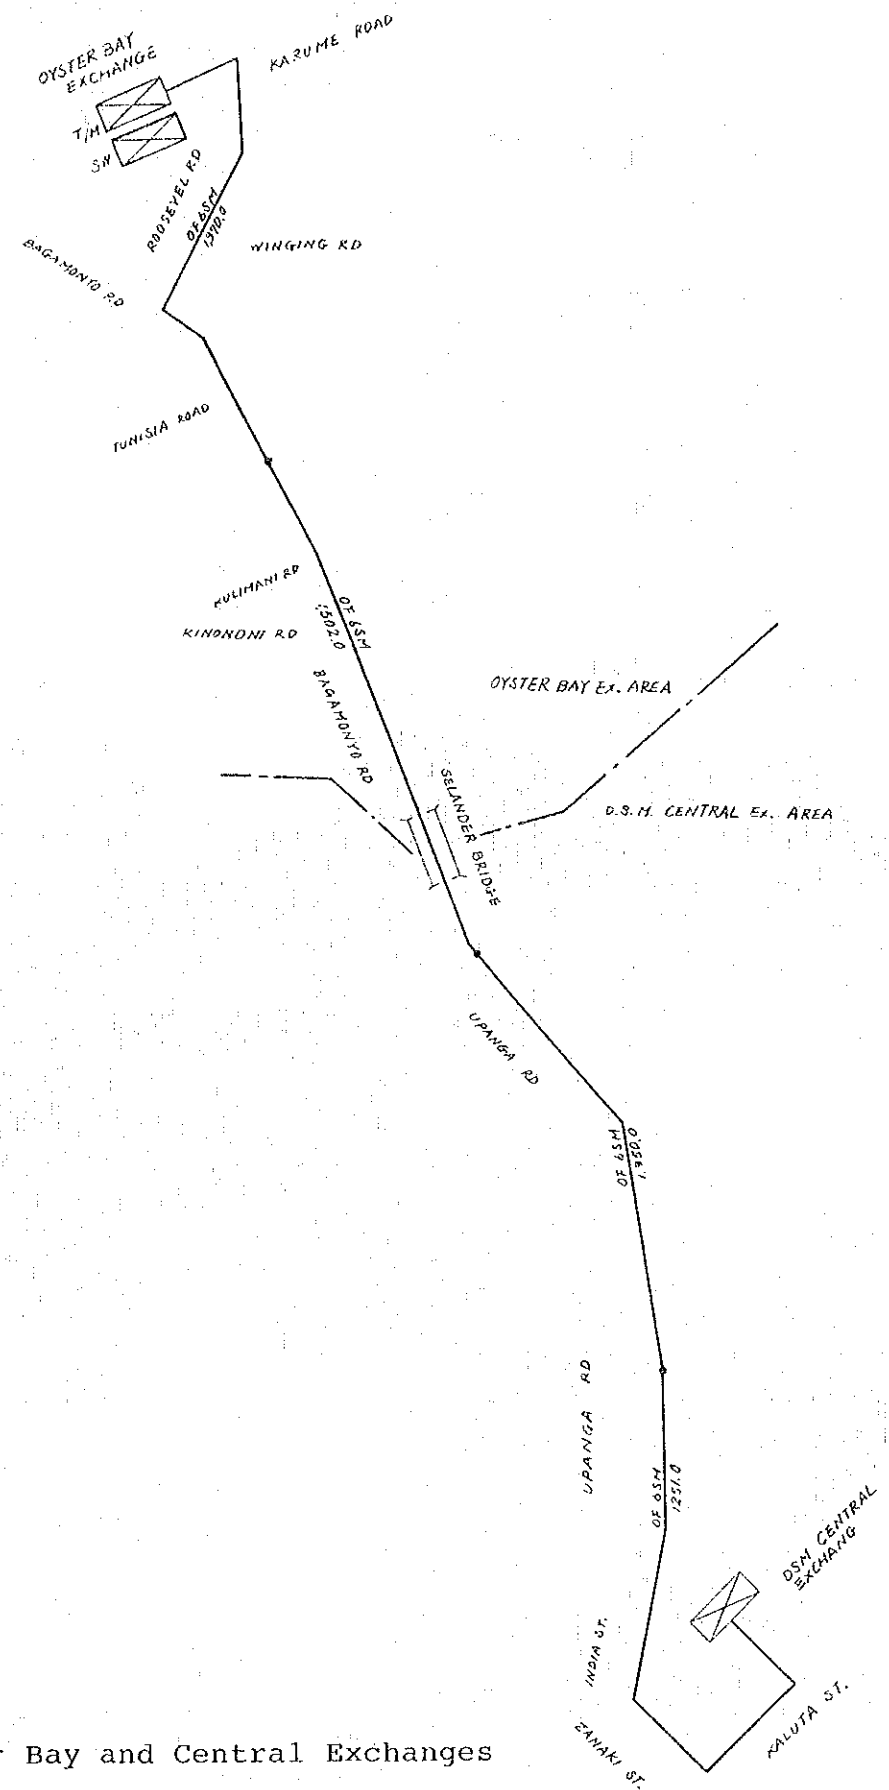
Junction Cable plan between Oyster Bay and Central Exchanges
